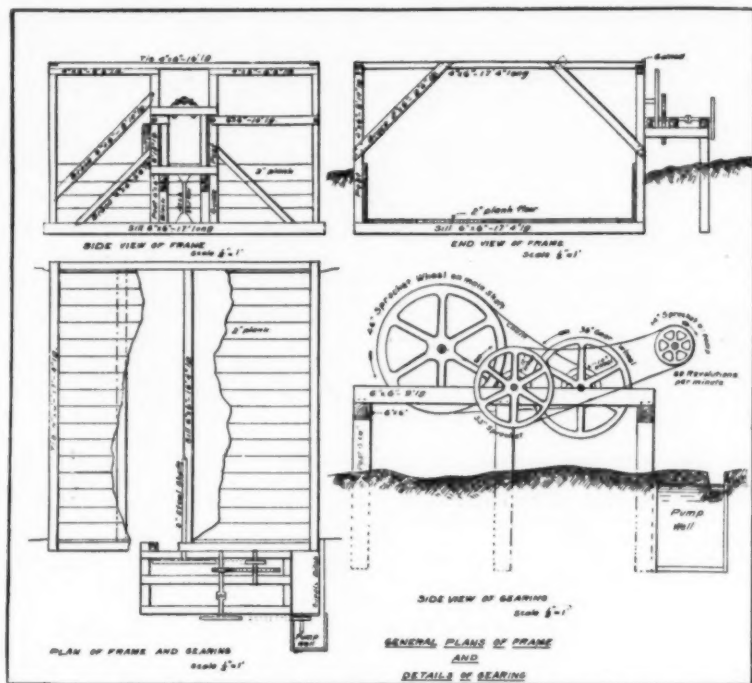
FRAMING AND GEARING FOR WHEEL SHOWN IN FIG. 18.
